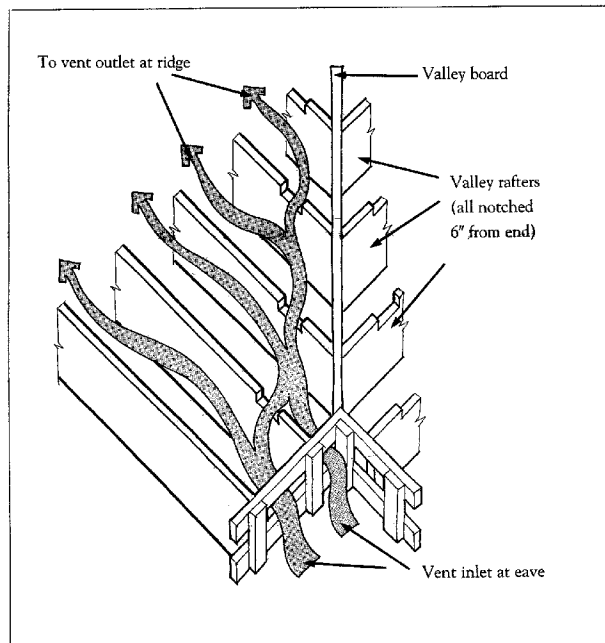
At hips and valleys, where rafter spaces don't connect to both eave and ridge, a series of notches allows in ventilation air. Similar notches are used around skylights and other obstructions.
